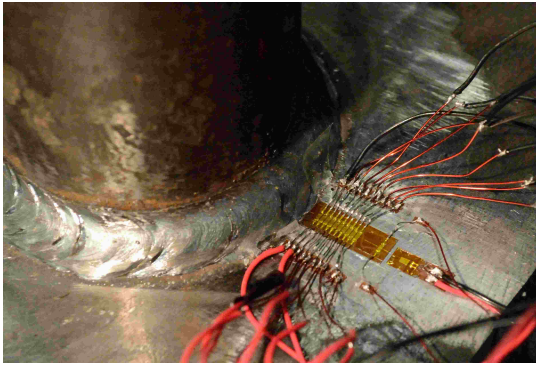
Strain gages placed on the plate of a type A specimen, nearby the the seam weld.
